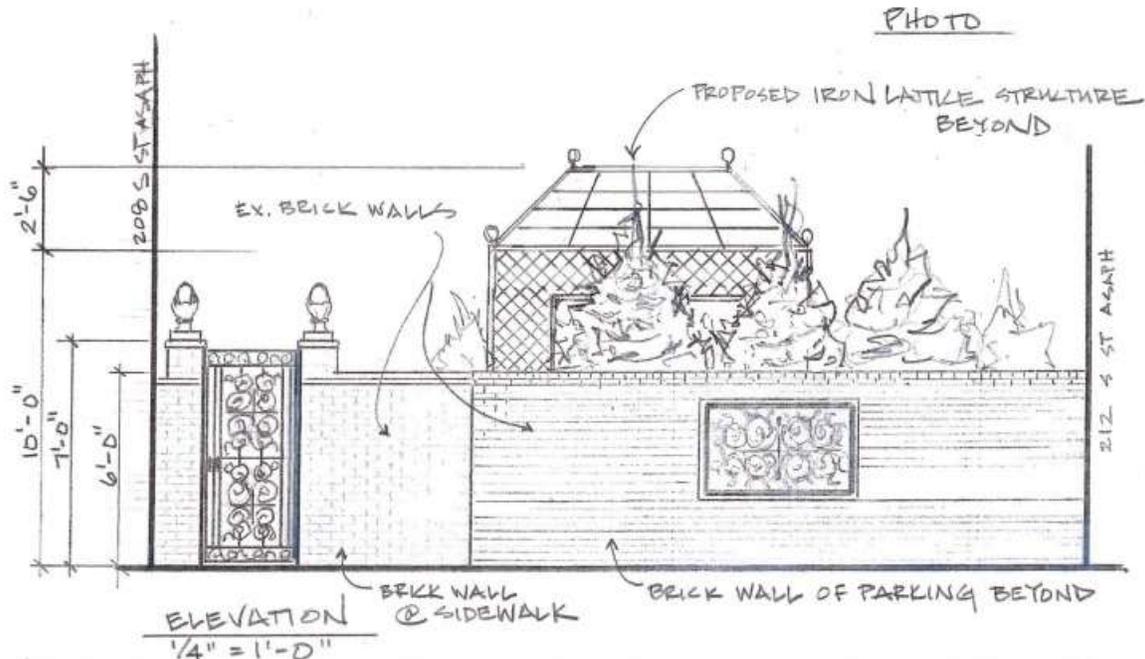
Visibility of garden structure from sidewalk. Note that the parking area is 21' deep and the structure will be placed 15' behind the brick wall; it will therefore be set back 36' from the sidewalk.
